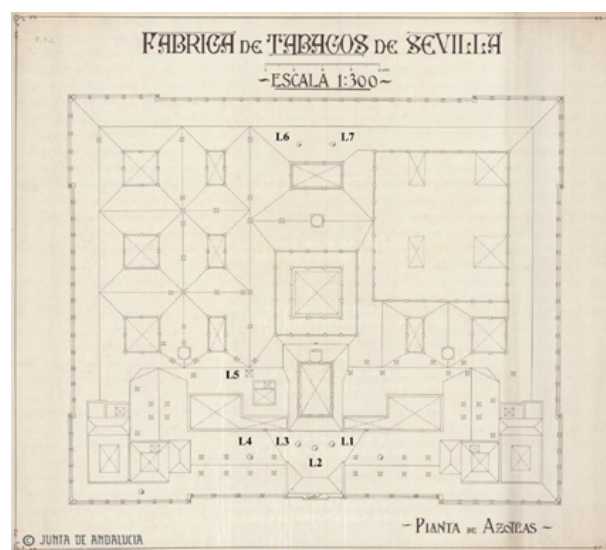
Floor plan of the roof of the Royal Tobacco Factory in Seville. Source: AHPSe, Seville Tobacco Factory collection.
